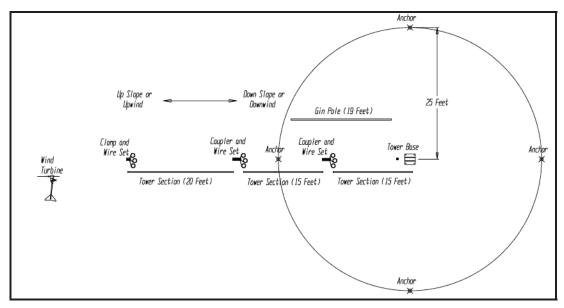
The layout details show the dimensions of the tower and the gin pole. The anchor positions are also illustrated. (after: Southwest Wind Power, 2007).
